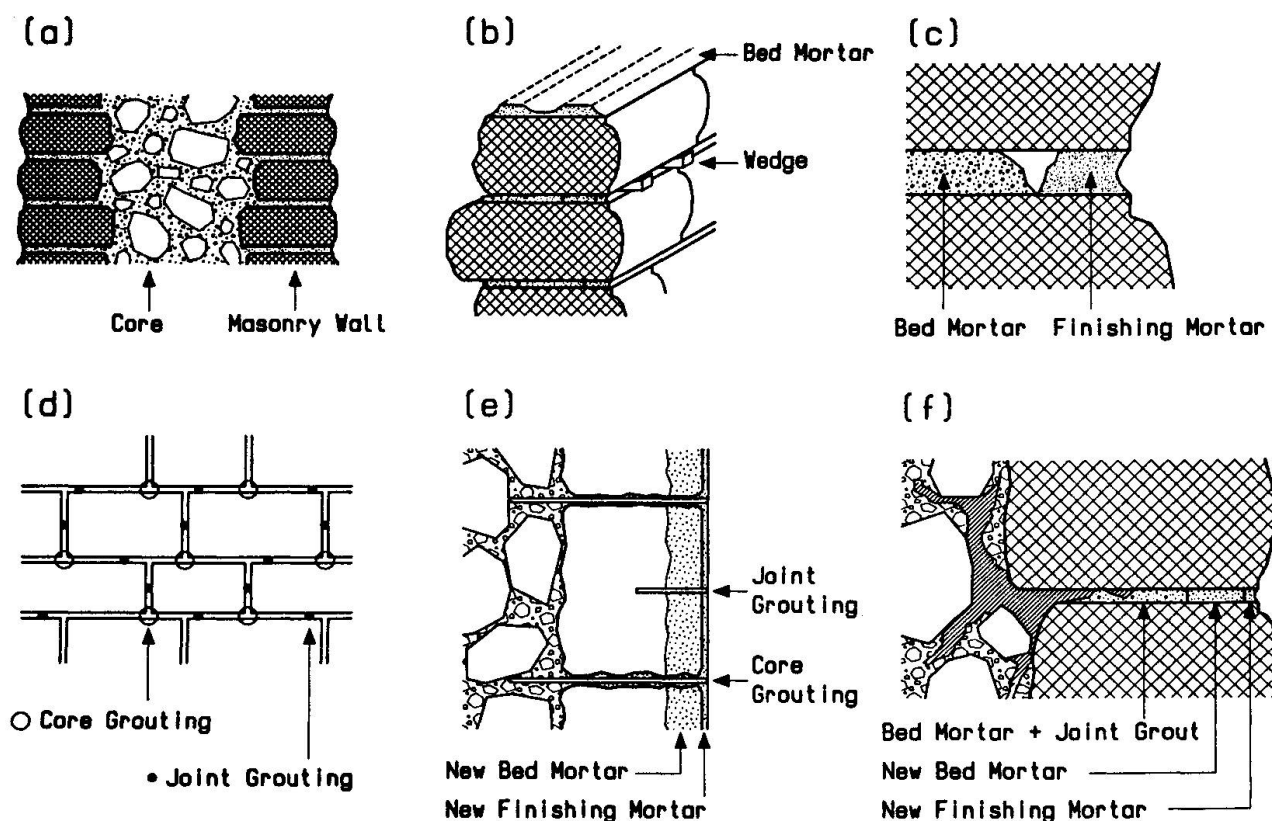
Natural stone masonry: (a) Vertical section through pier; (b) Placing of masonry blocks; (c) Bed joint; (d) Elevation showing grouting locations; (e) Plan view; (f) Cross-section through bed joint.
